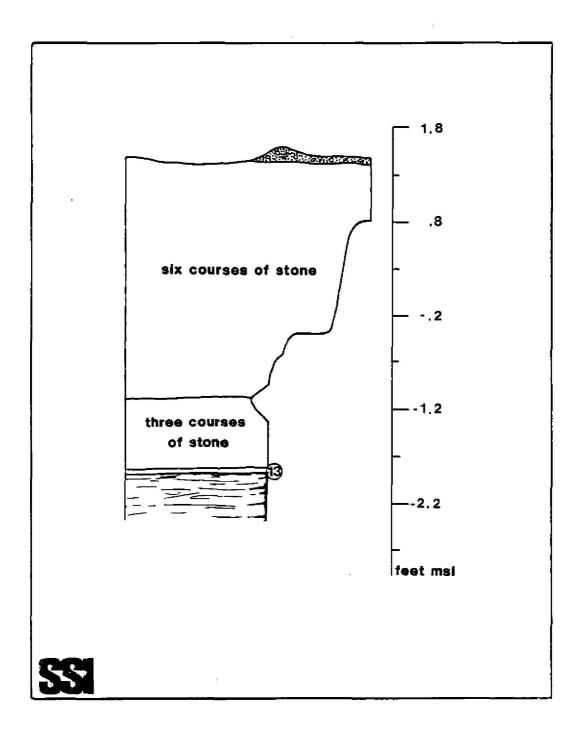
Profile, north wall of Test Cut V in Lot 45.
